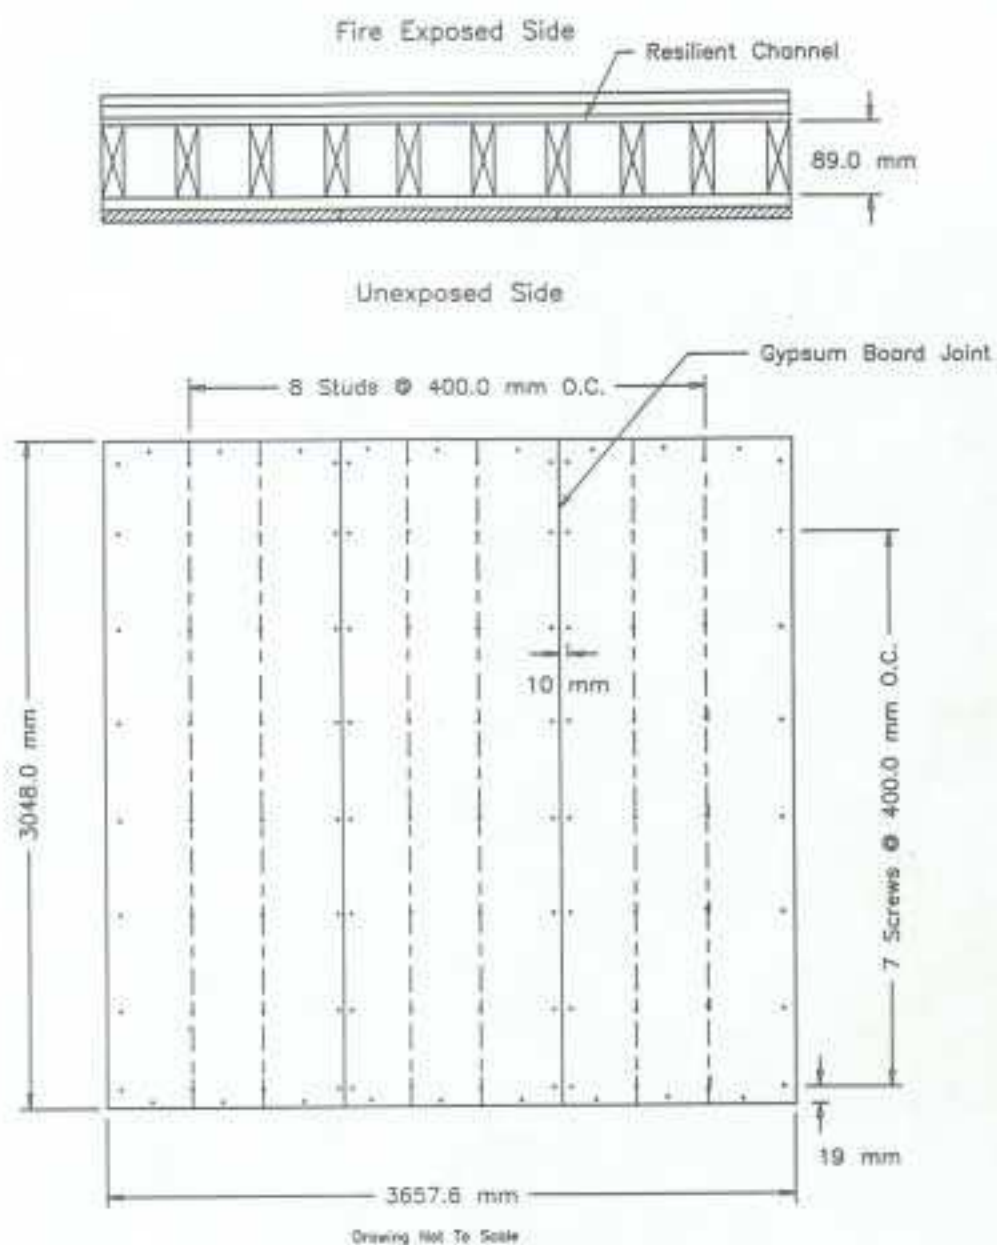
Screw Locations For Wood Stud, 2x2 Gypsum Board Layers, Full-Scale Assembly, Resilient Channel on Exposed Side (Face Layer Unexposed Side)
